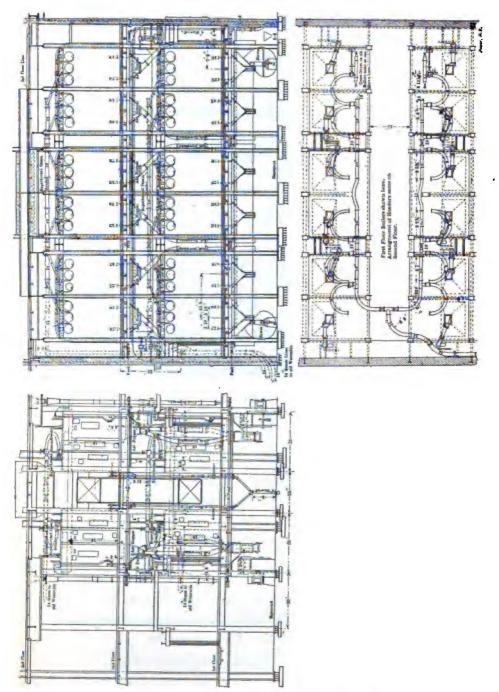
New York Edison Co.'s Waterside Station No. 2: Piping Detail. (See also pp. 444, 455, 491.)
